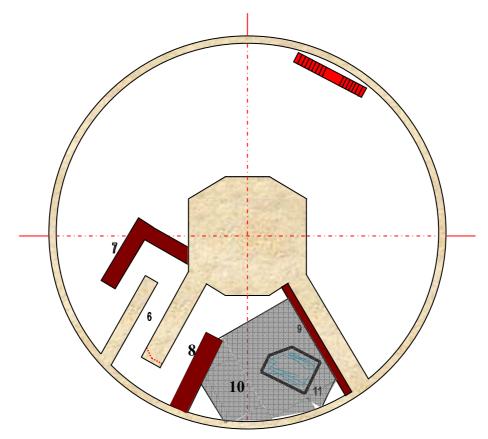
Reactor basement with increased wall and ceiling and two extra walls. 6: labyrinth; 7–9: additional concrete walls; 10: additional concrete ceiling; 11: excavation of the 60 Co sources.
